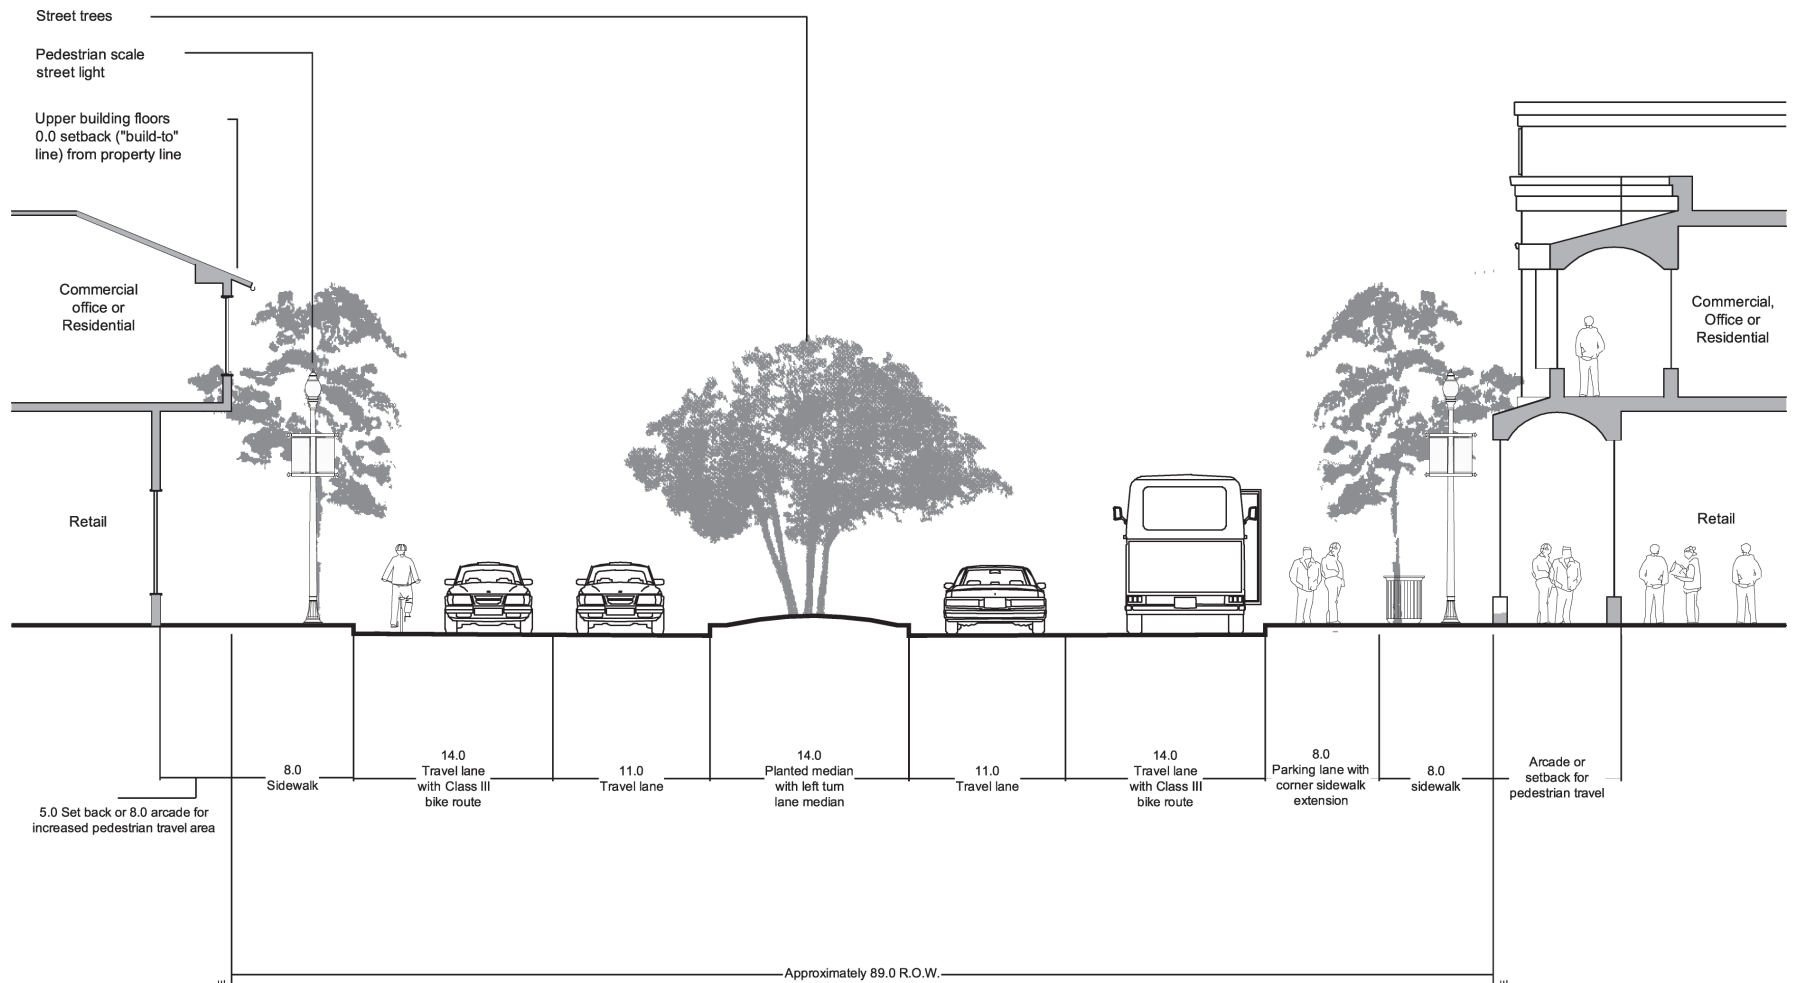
Section E.: San Pablo Dam Road Outside of the Village Center (with median)
